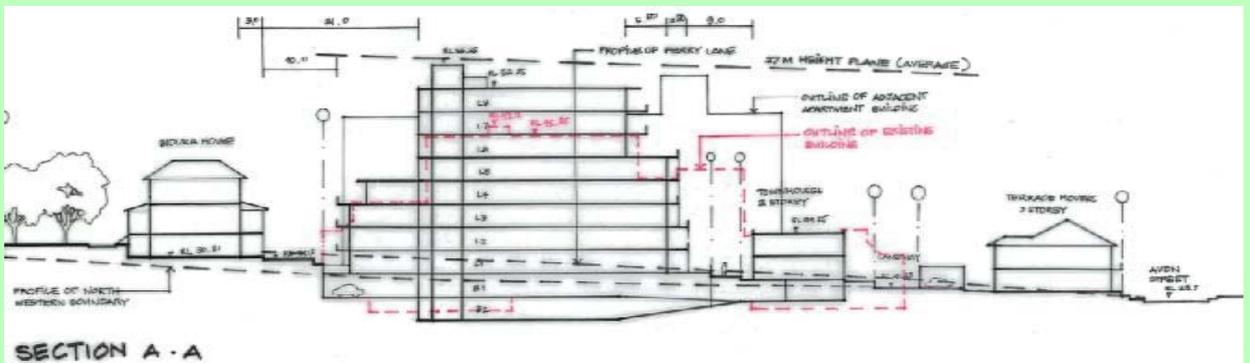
Section of preferred Building Envelope (Giles Tribe Architects)
